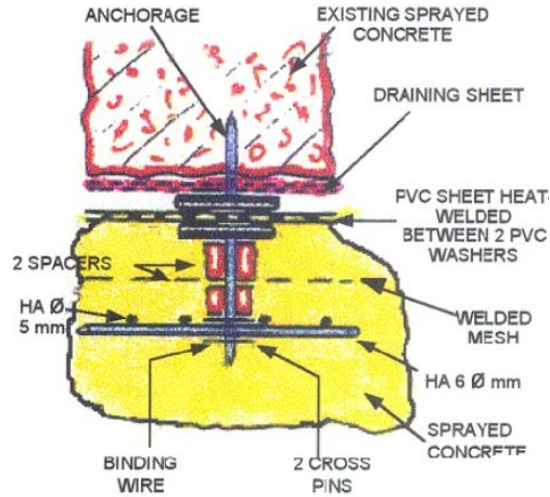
Sealing of leakage water using a drain sheet, PVC sheet heat-welded between washers, and a reinforced, welded-mesh sprayed concrete anchored to the existing concrete surface (Russell, 2001).
